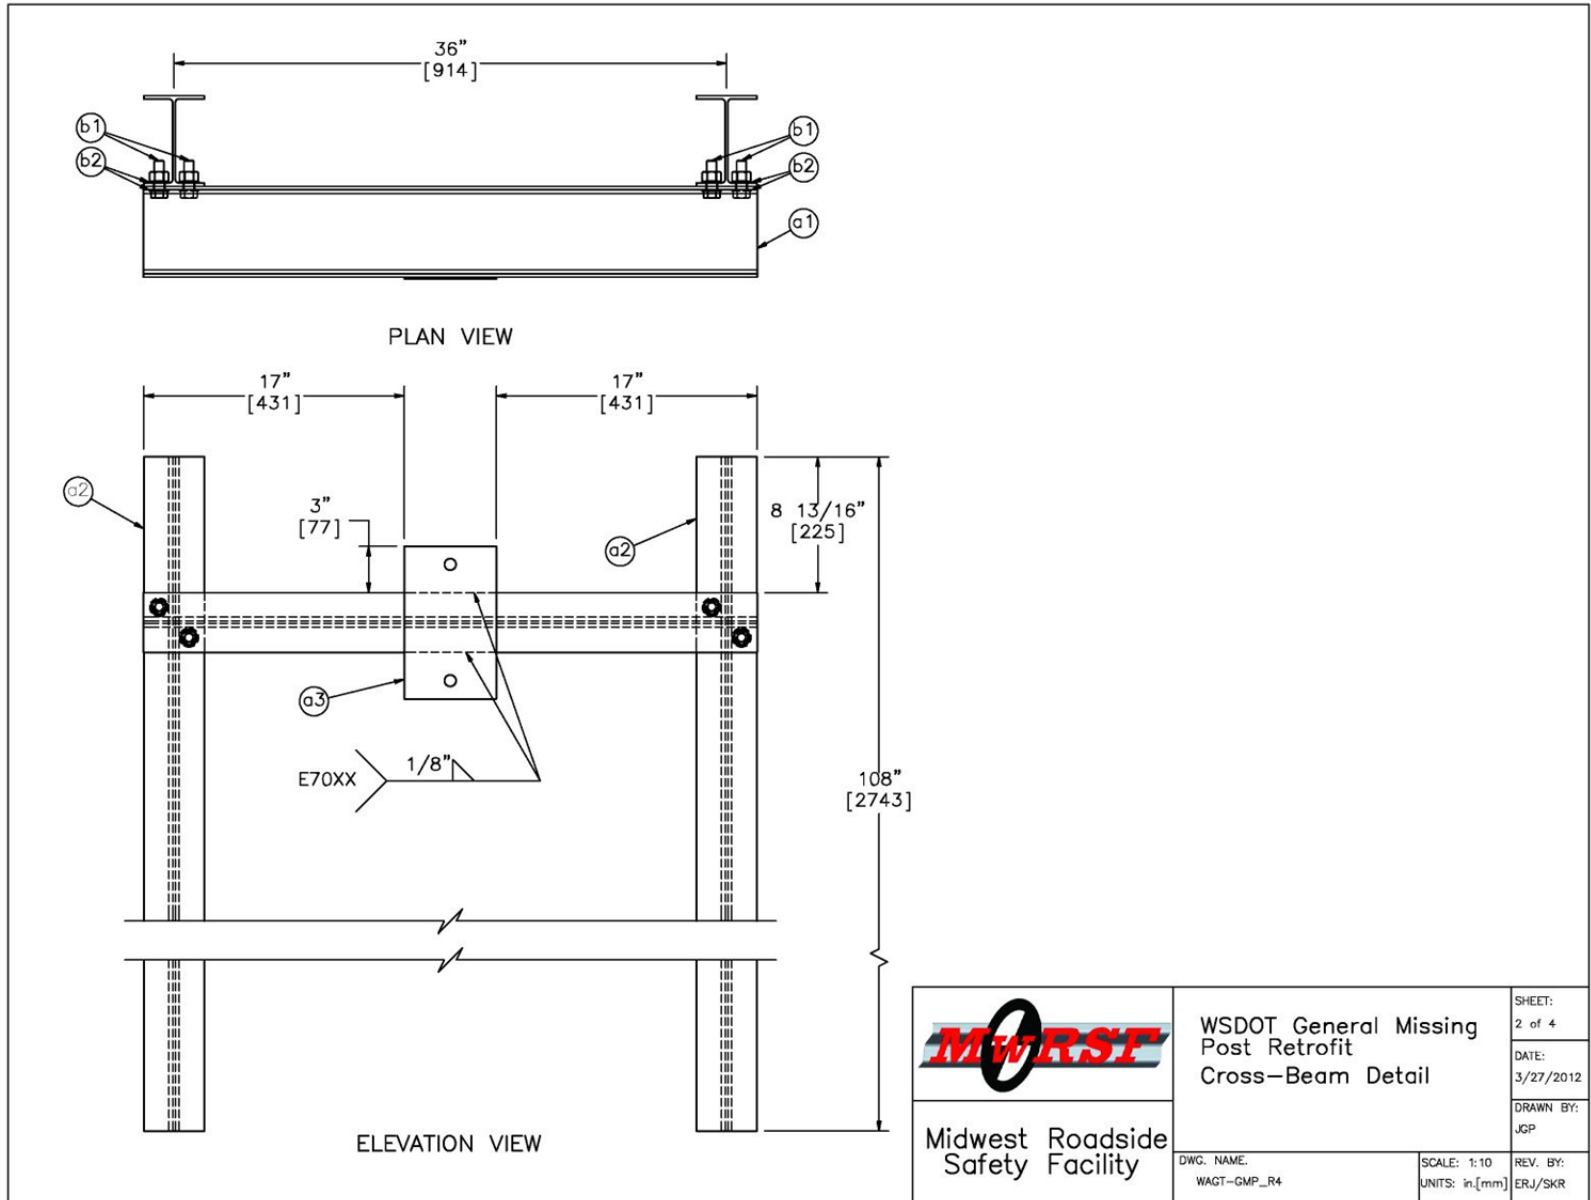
Retrofit 3B – General Missing Post Cross-Beam Detail
